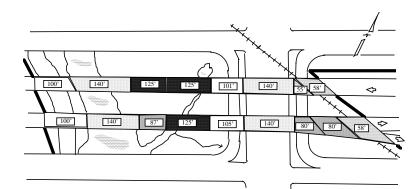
Original TxDOT Span Layout Bold Lines Indicate Retaining Wall Positions
